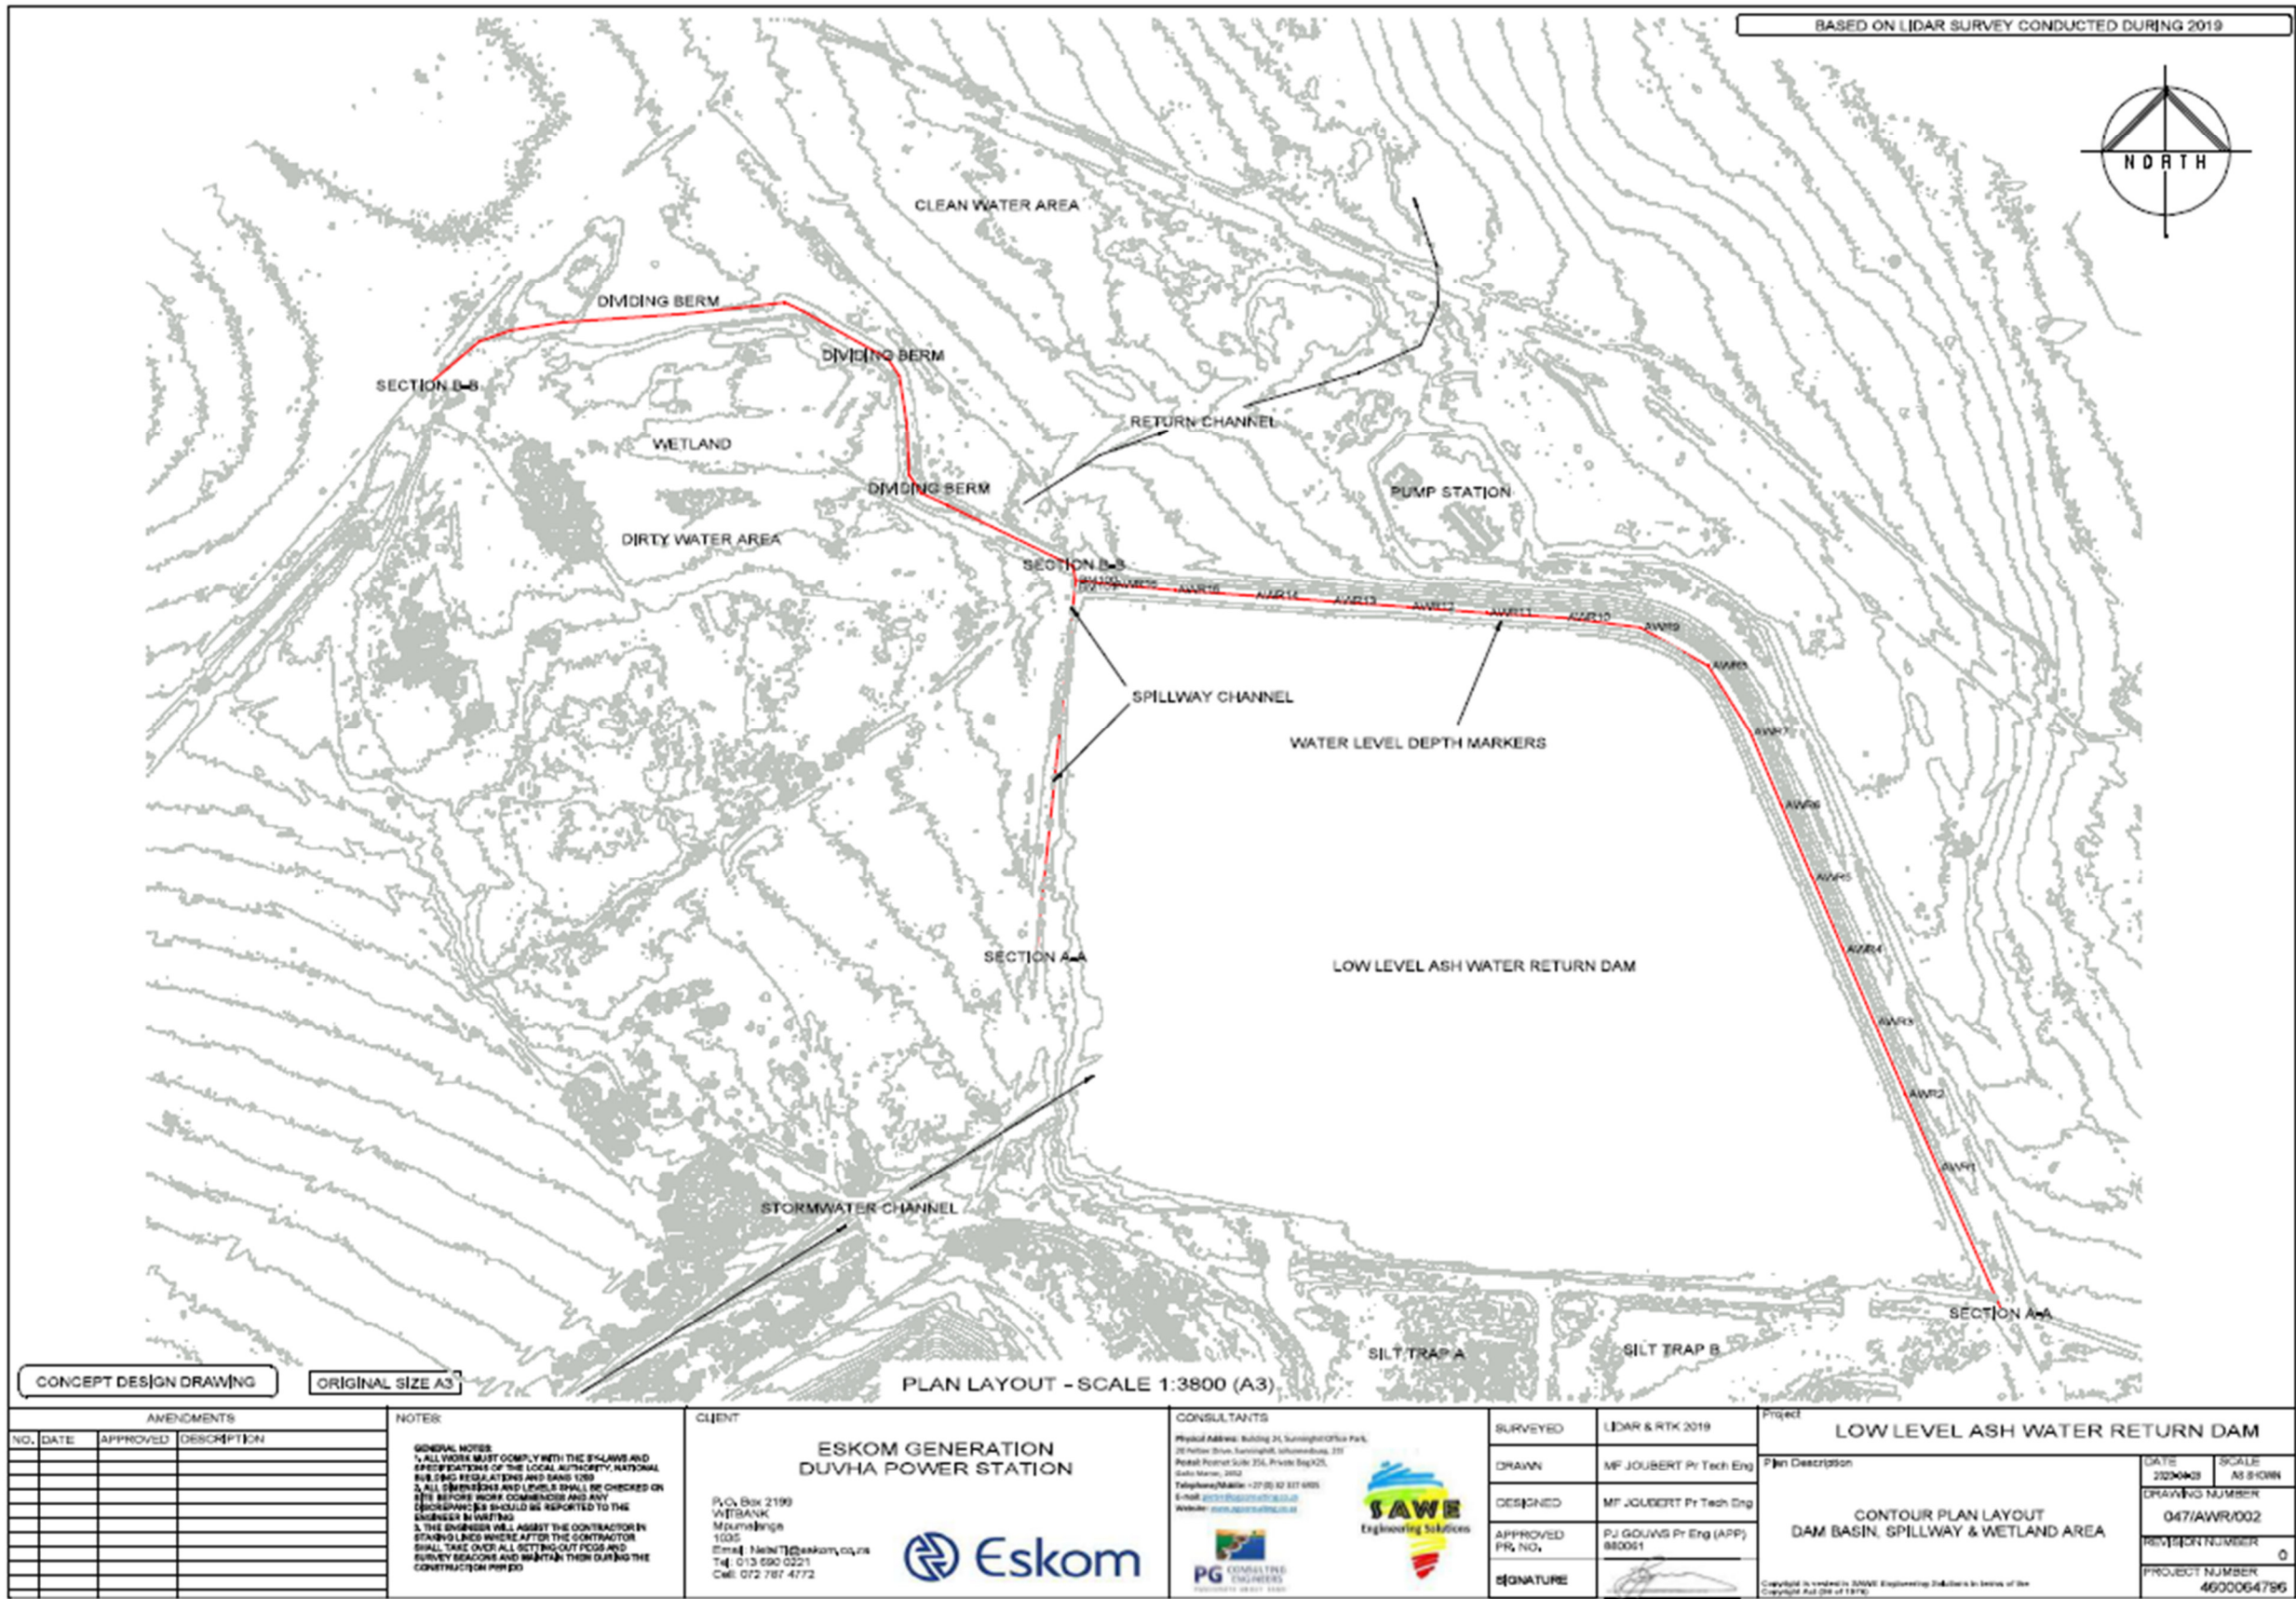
Contour Plan Layout Dam Basin Spillway and Wetland Area
